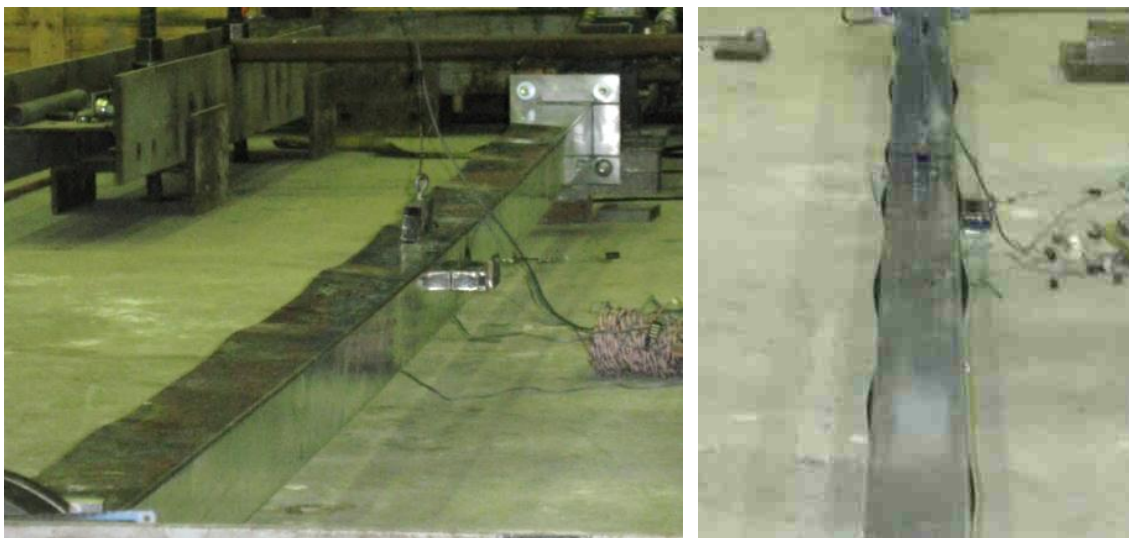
Local Buckling of Flanges Observed on Column Tests to 20 kips: “Adhesive-Only” (Left) and “Adhesive and Screws” (Right)
